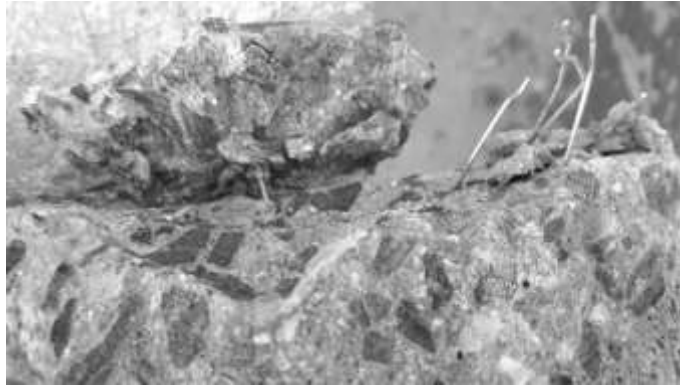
Fibre pullout in single hooked steel fibre reinforced concrete specimens in flexural loading.
